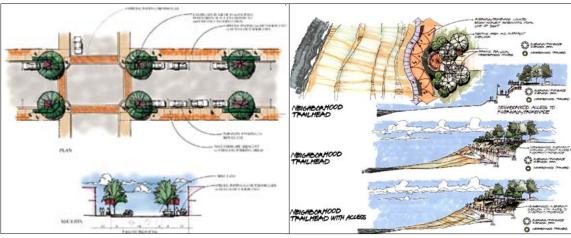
23: Proposed streetscape (EDSA Master Plan Report).
